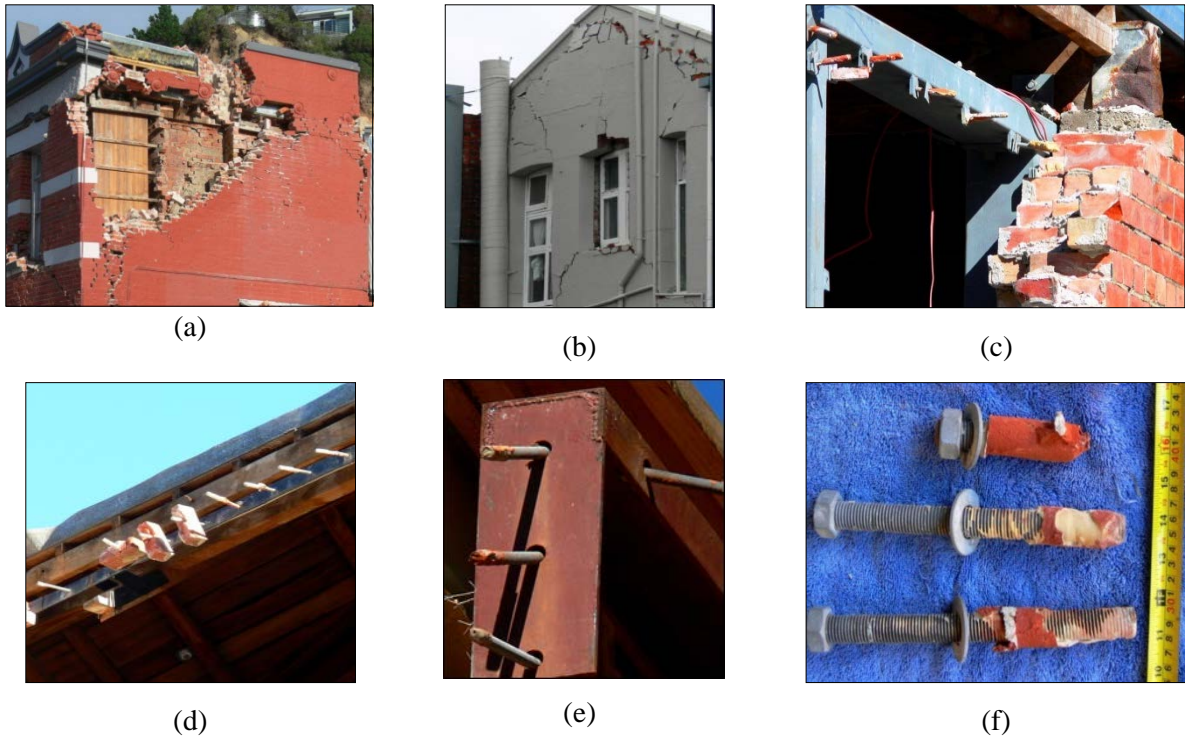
Wall-to-diaphragm anchors: a) Row of successful wall-to-diaphragm anchors, with wall failure beneath; b) Failure of the gable due to low shear strength of masonry, despite sufficient anchorage; c) Insufficient embedment depth of adhesive anchors; d) Large number of adhesive anchors unsuccessful at preventing out-of-plane collapse of URM wall; e) Insufficient adhesive used only at the tip of anchors; f) Recovered adhesive anchors that performed inadequately.
